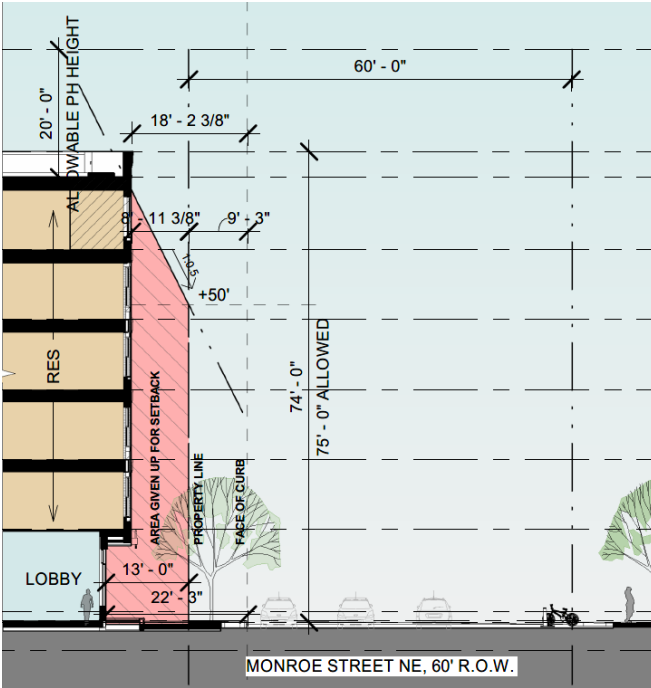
Section drawing of Monroe Street frontage showing building setback.
